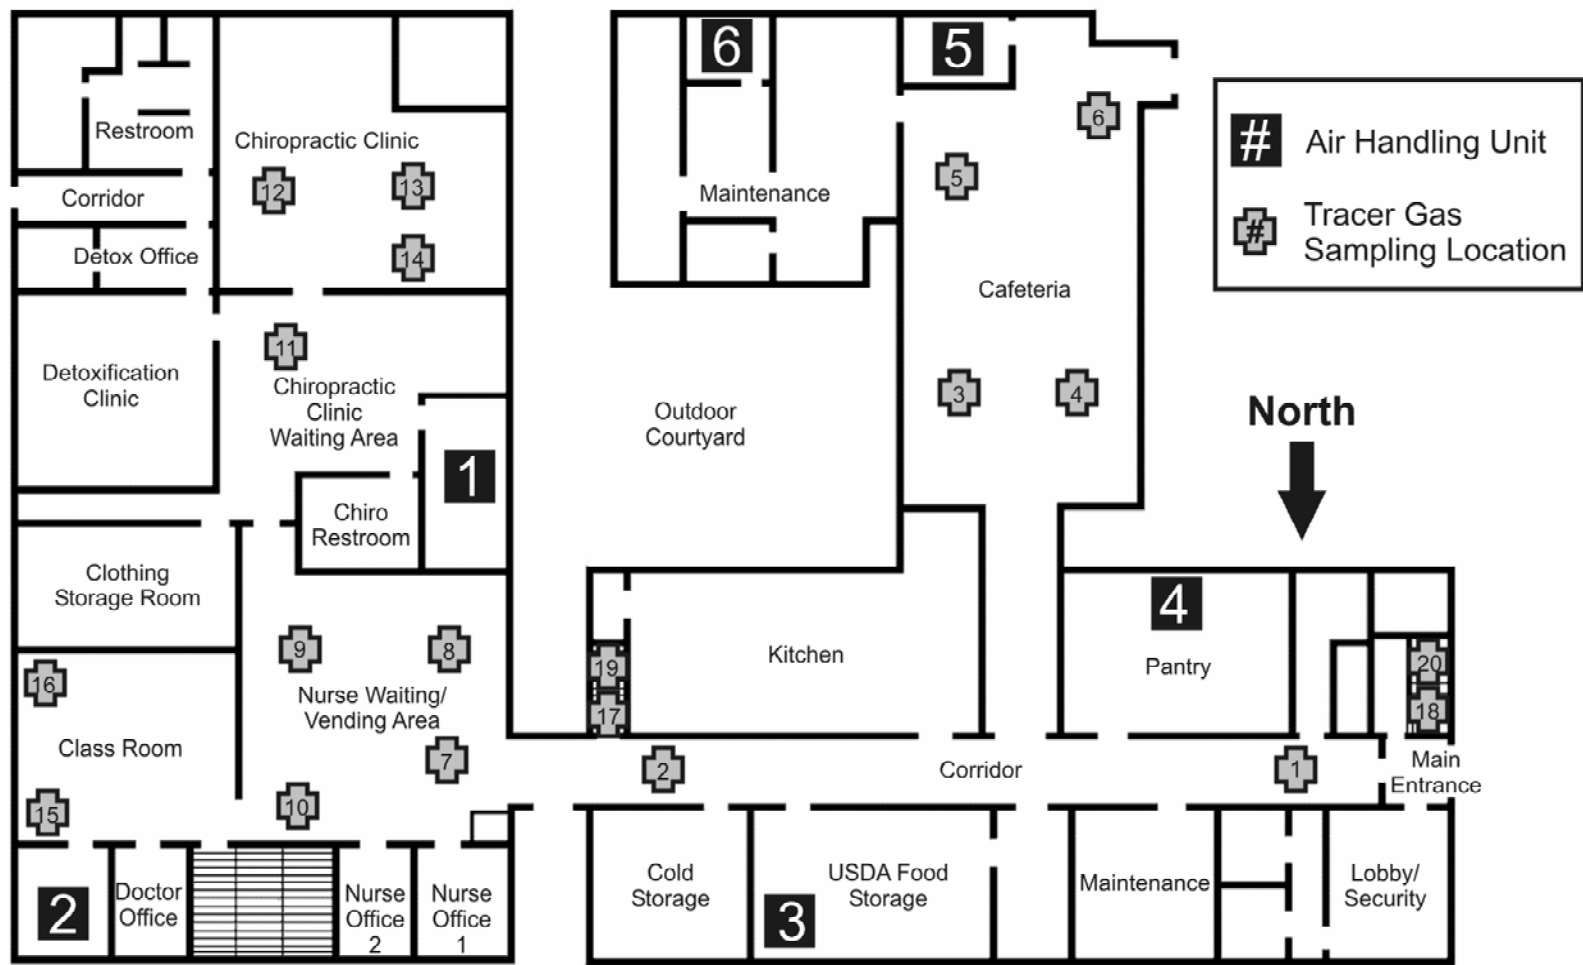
Tracer gas sampling locations on the first floor of the main building. Samples 17 and 19 were collected on the second floor and third floor landings of the east stairwell, respectively. Samples 18 and 20 were taken on the second floor and third floor landings of the west stairwell, respectively.
